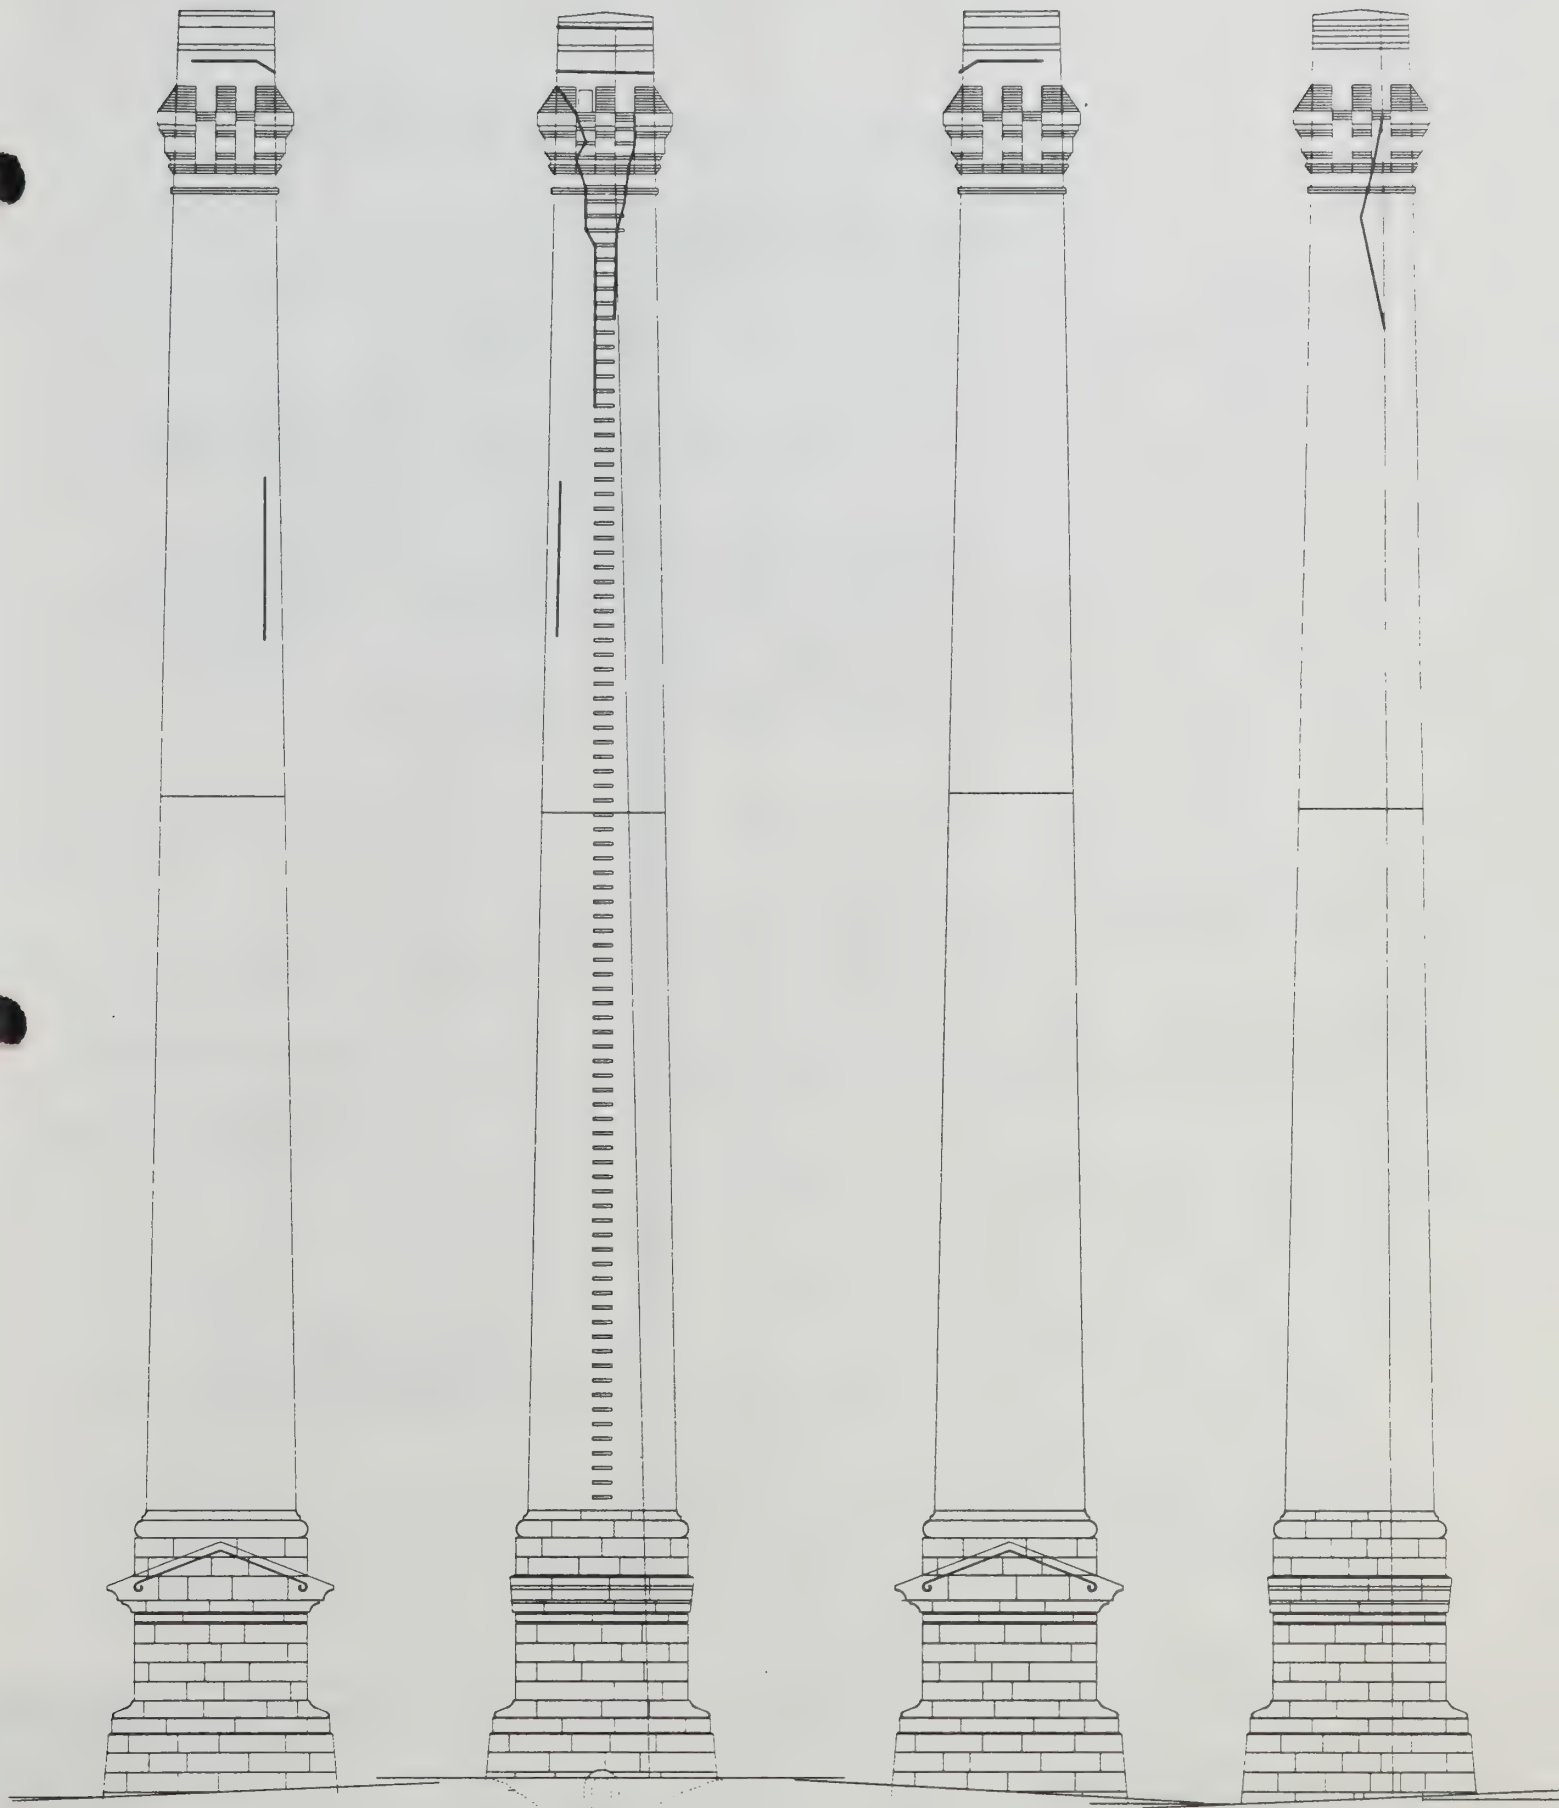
Chimney – South Elevation at Corbelling — East Side
